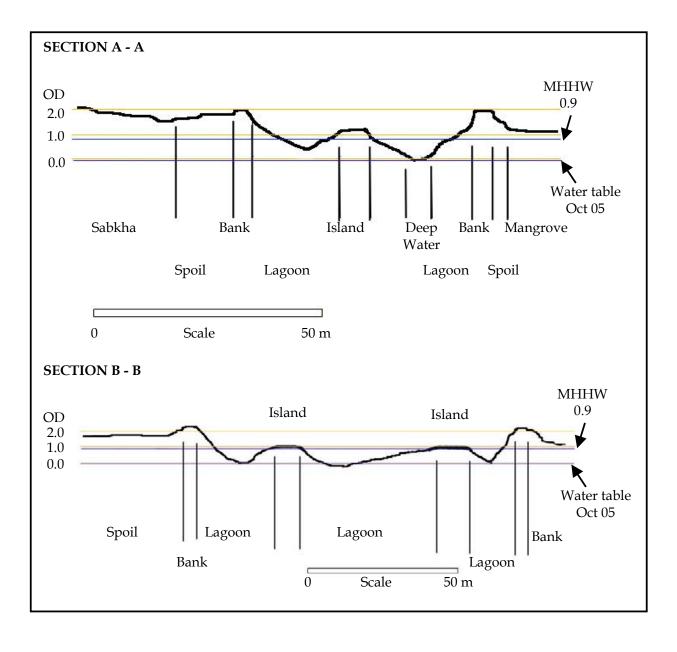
Section plans of constructed natural lagoon. See Figure 2.2 for location of sections.
